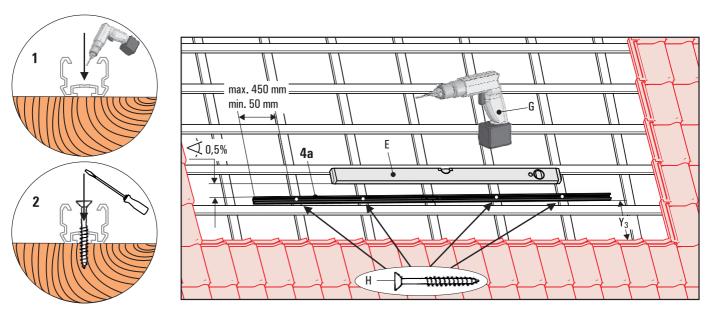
Adjust lower mounting rails (4a) and tighten with particle board screws (H) on the rafters.
